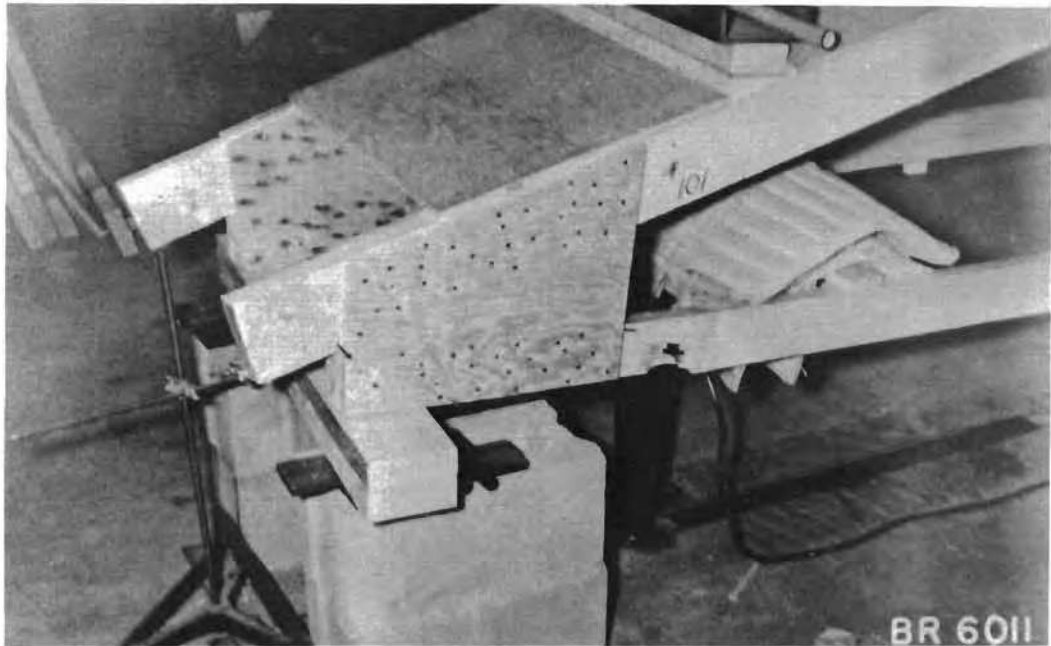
Failure caused by the lower chord breaking in tension near the heel joint.
